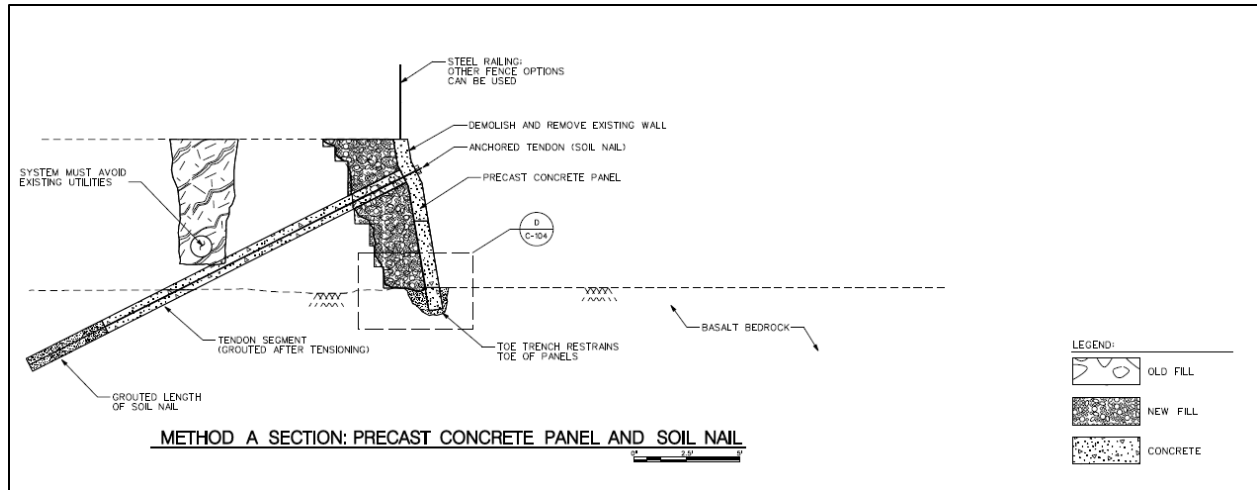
Method A – Tied-Back Precast Concrete Panel Walls
